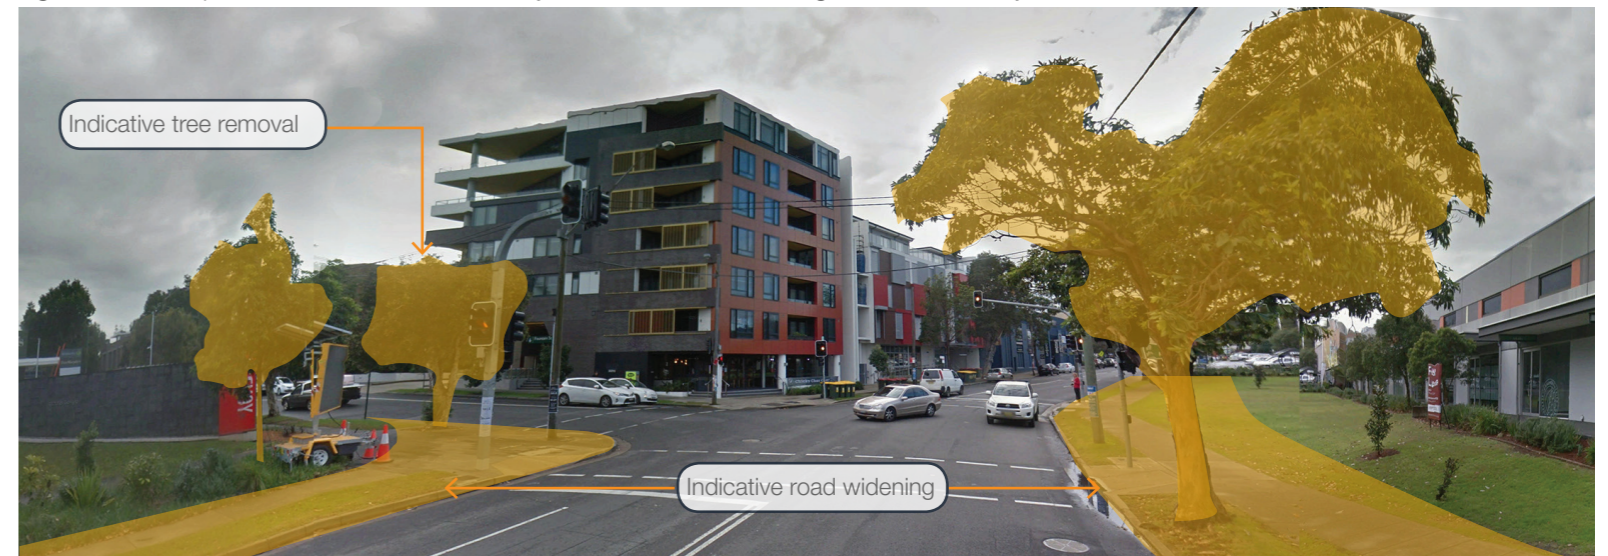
Viewpoint 02: McEvoy Street intersection, looking North into Fountain Street
